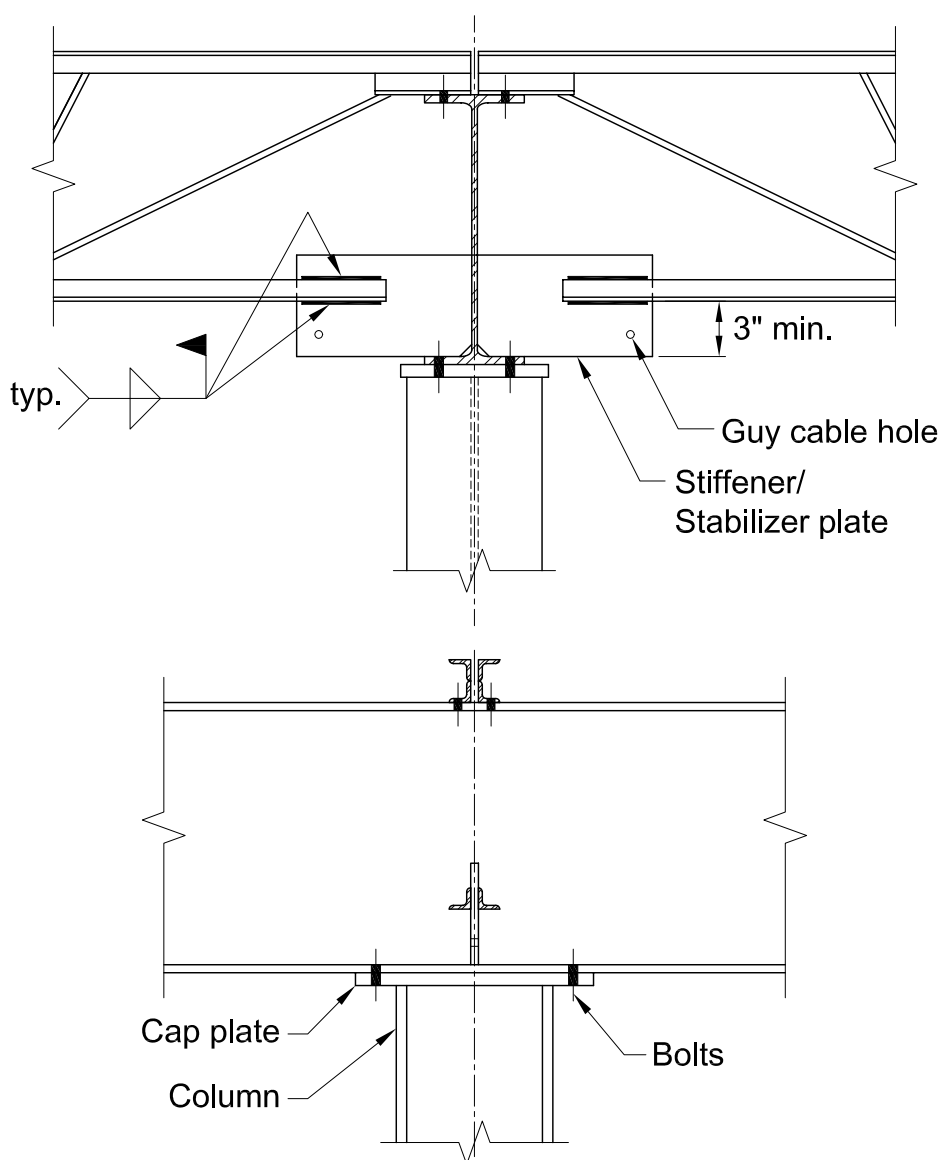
Beam framing continuously over column top, stability provided with welded joist-chord extensions above column top.
